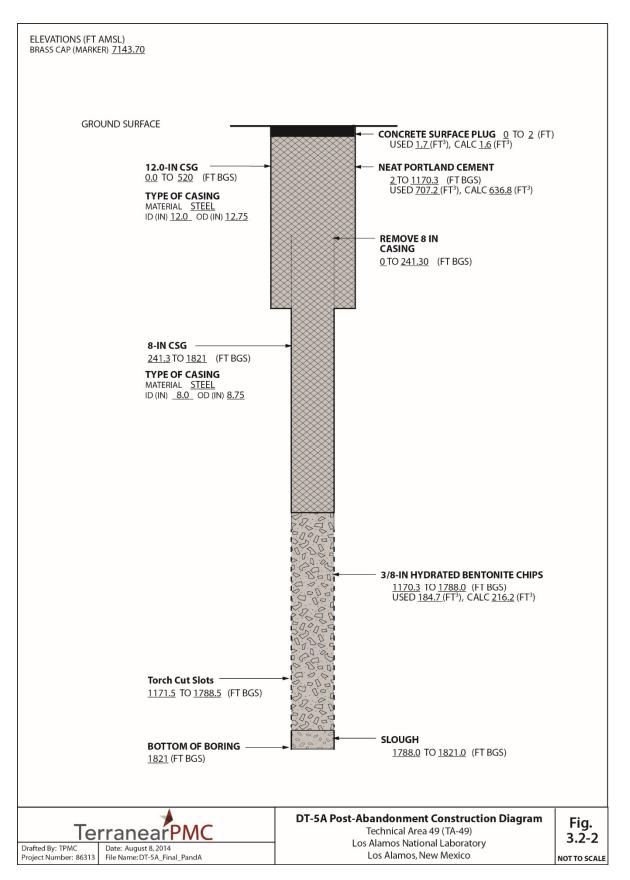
Test well DT-5A post-abandonment construction diagram
